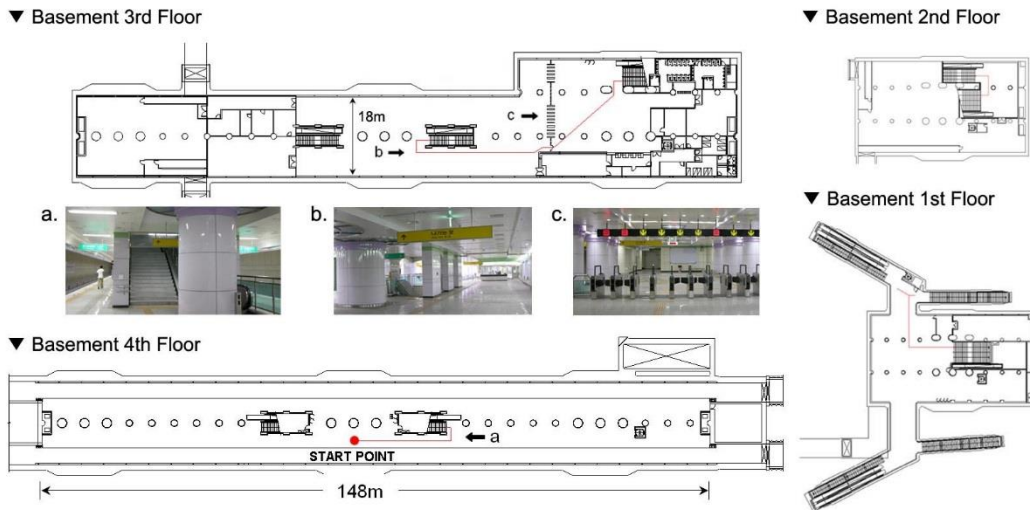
Subway station. The fourth underground story was being used for subway platforms while the third underground story was being used for tickets and waiting rooms.
